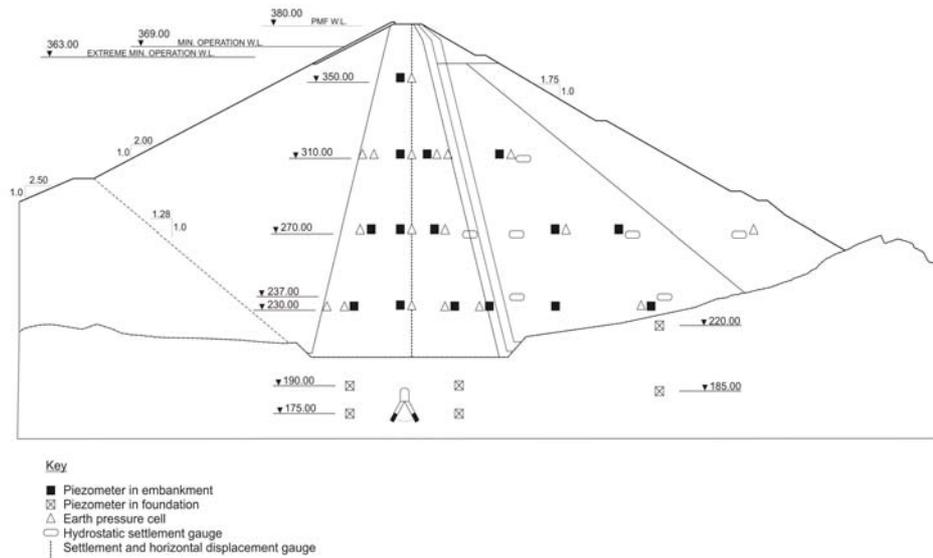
Typical Instrumentation Arrangement at Masjed-e-Soleiman
